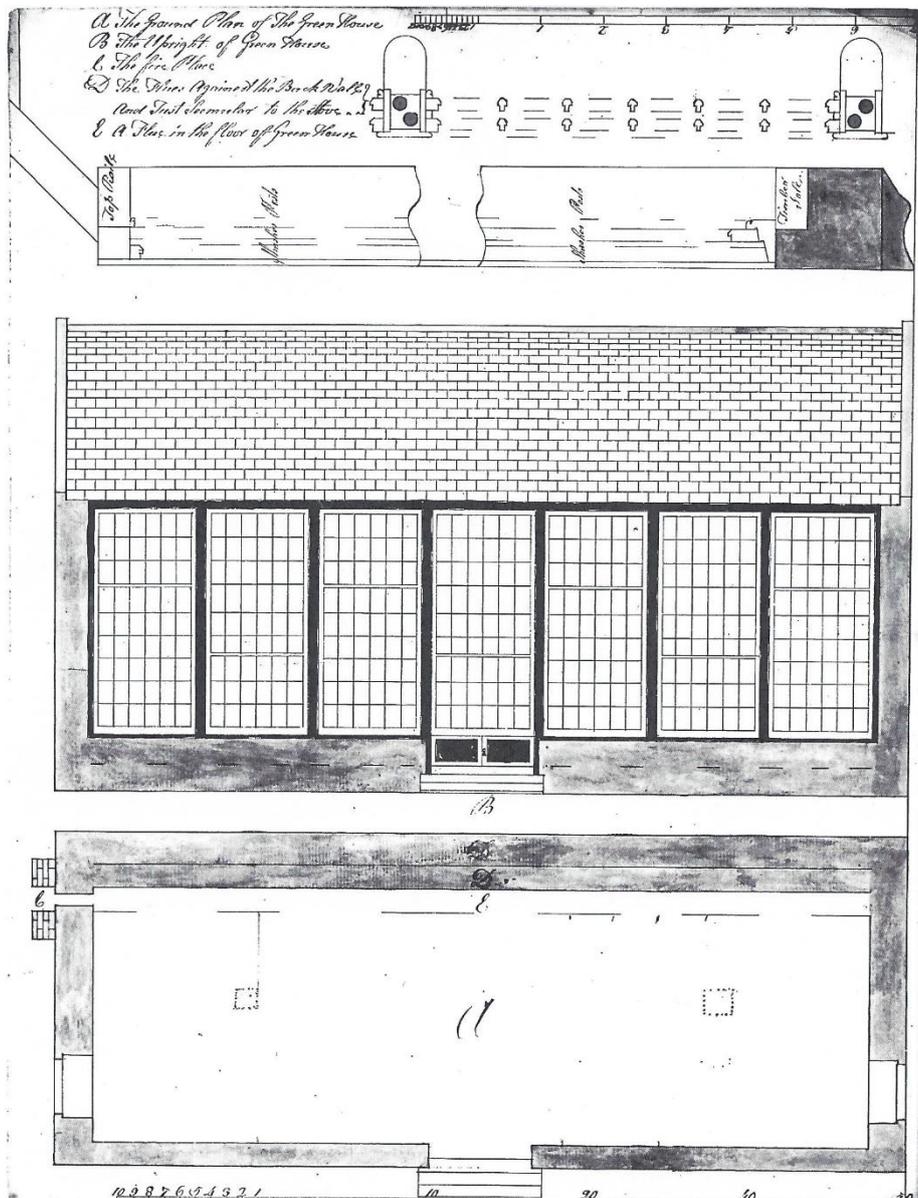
Architectural drawings of the Leith Walk Greenhouse, RCAHMS.
